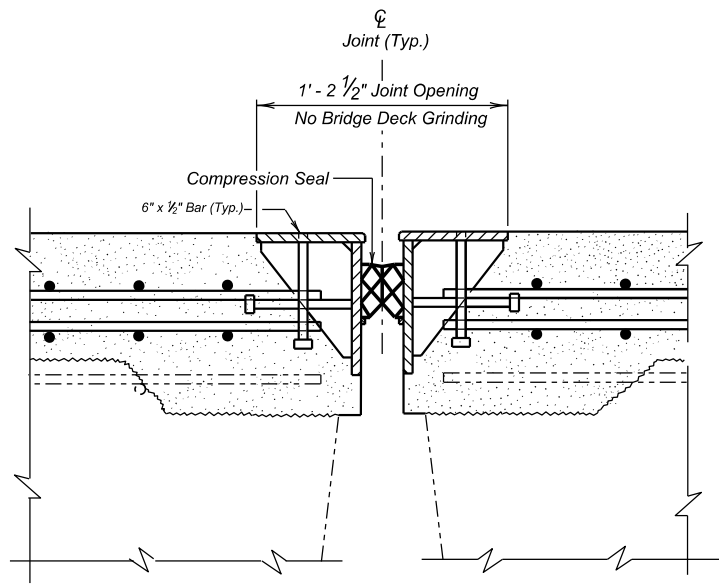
#### DETAILS AND DIMENSIONS OF EXISTING BRIDGE
